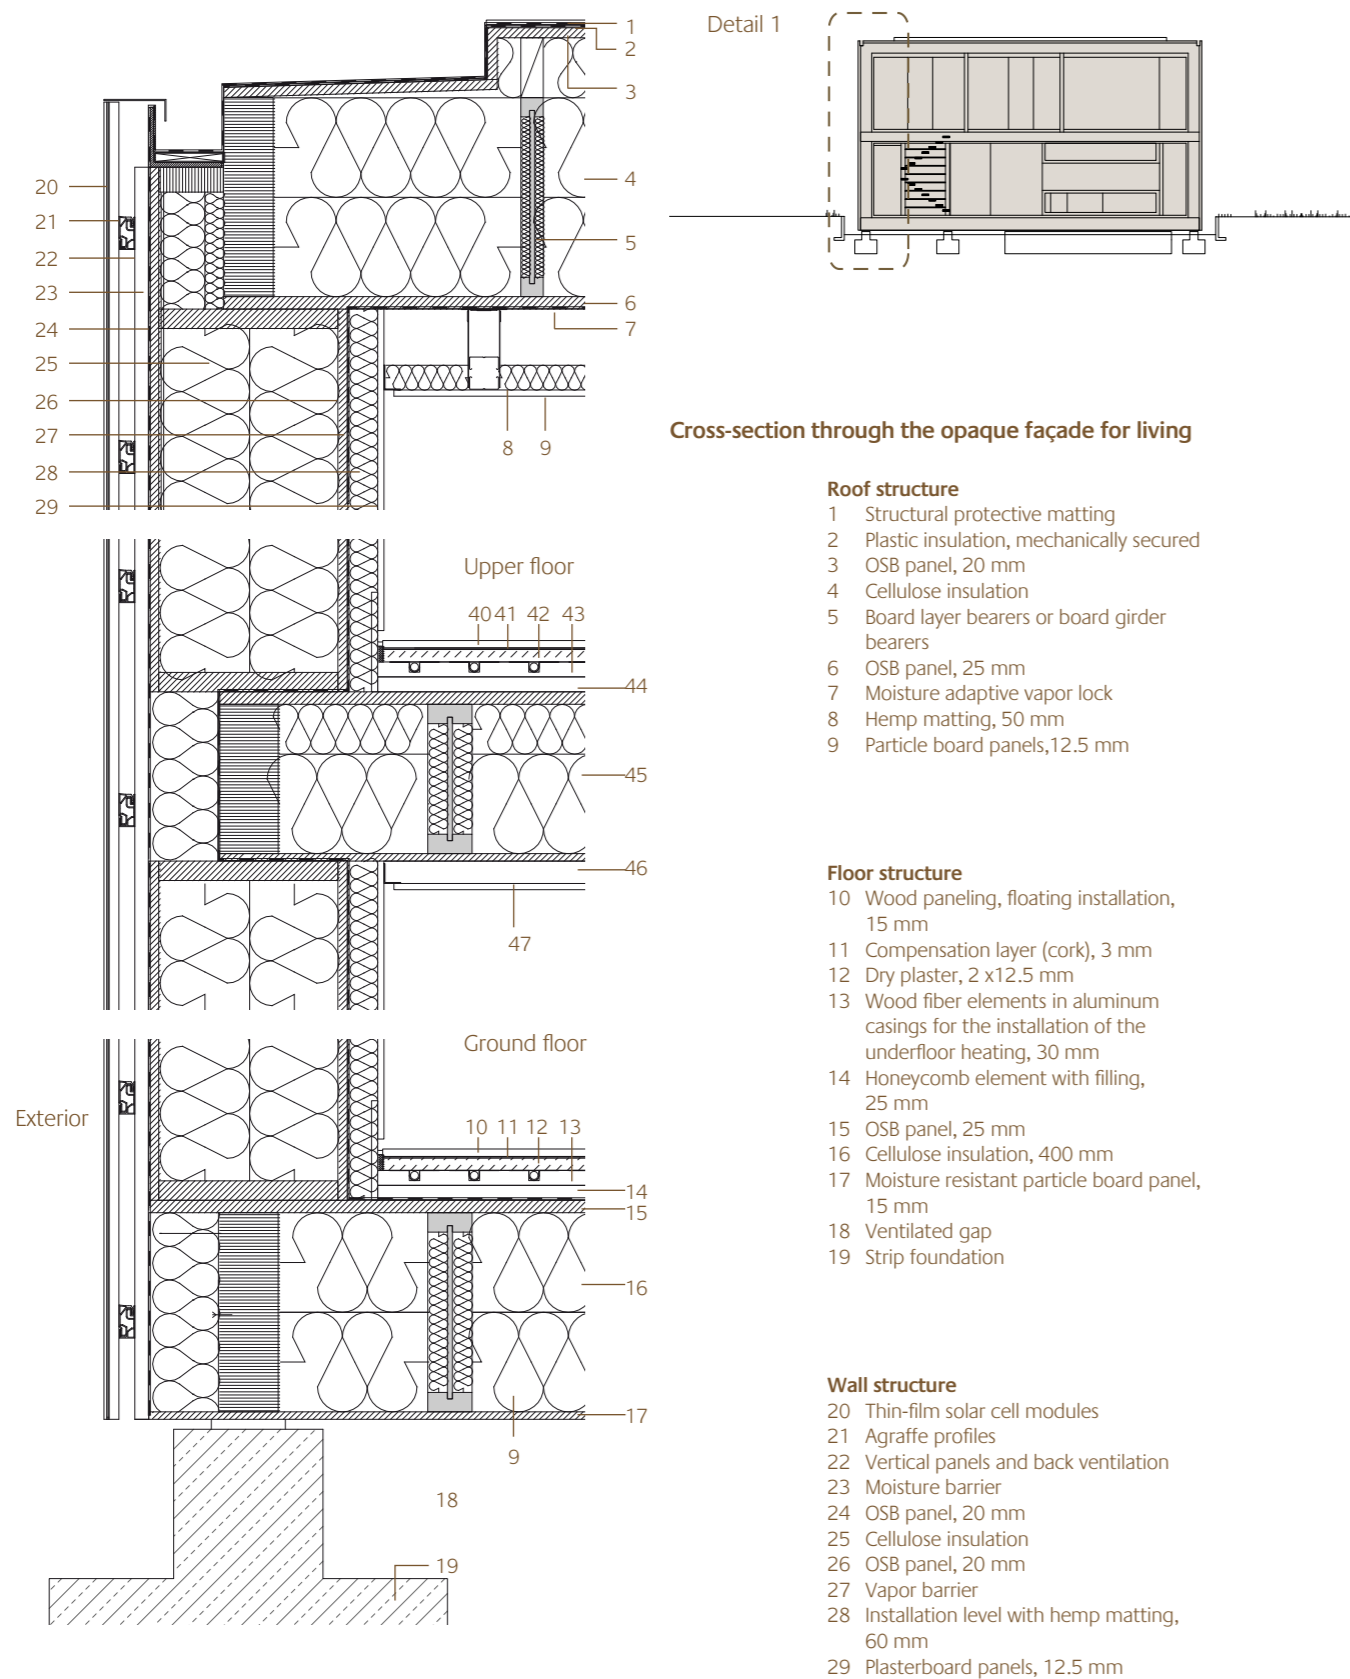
Detail 1 Cross-section through the insulated, opaque exterior wall
